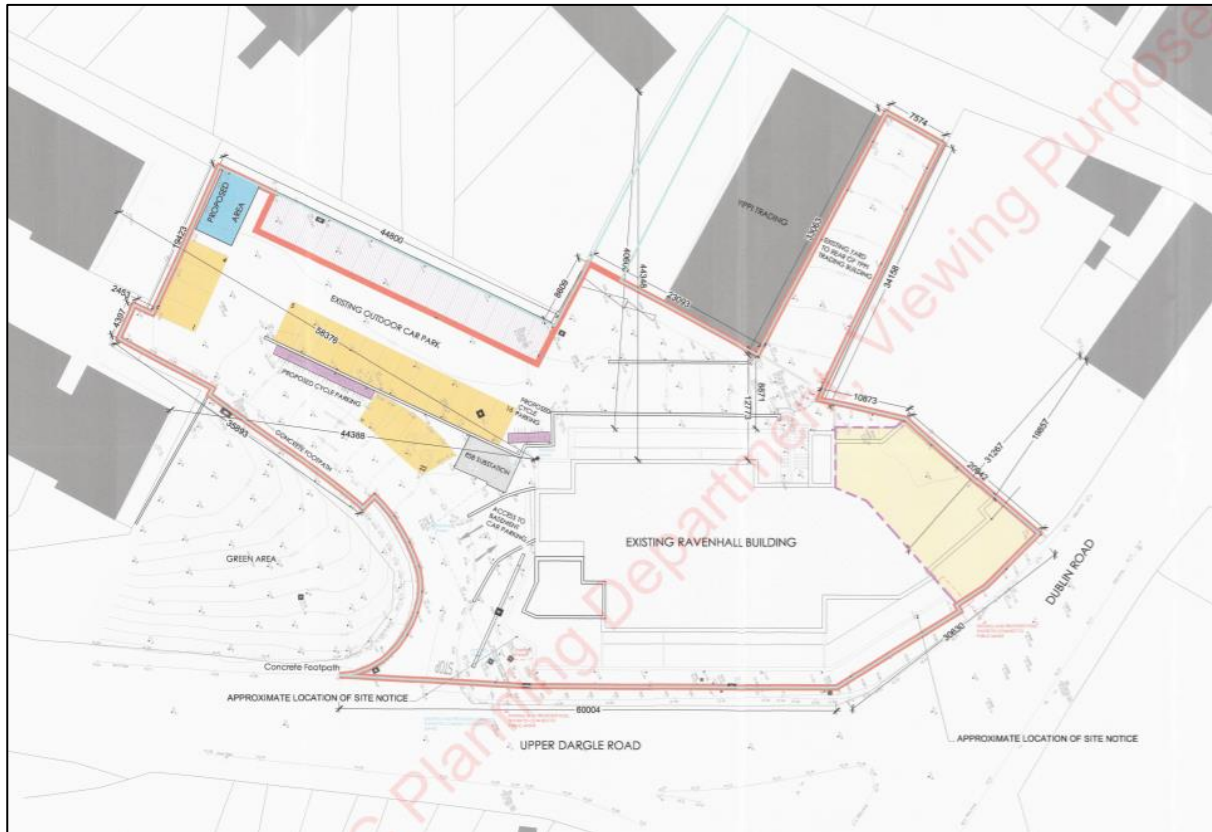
Proposed Site Layout Plan – Ravenhall Building © Wicklow County Council 2020
